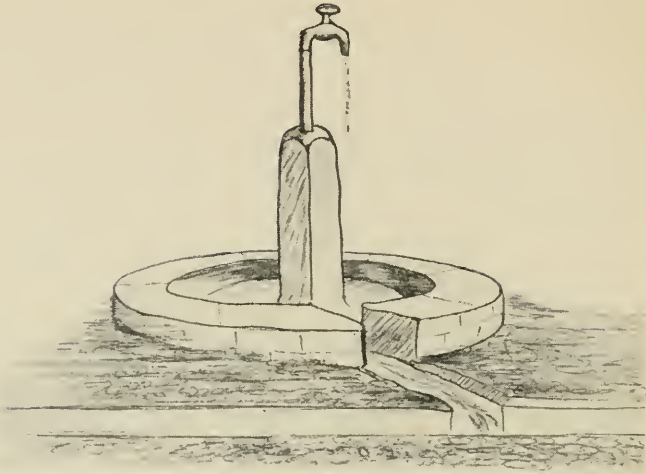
Street 'Stand-Pipe' showing Benching.
